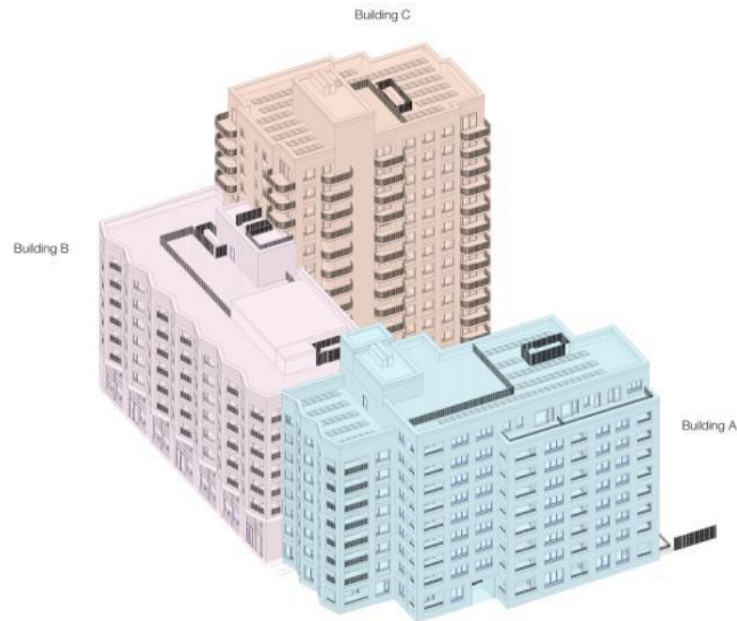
Proposed massing with Building A fronting Willow Walk and Building B fronting Crimscott Street
